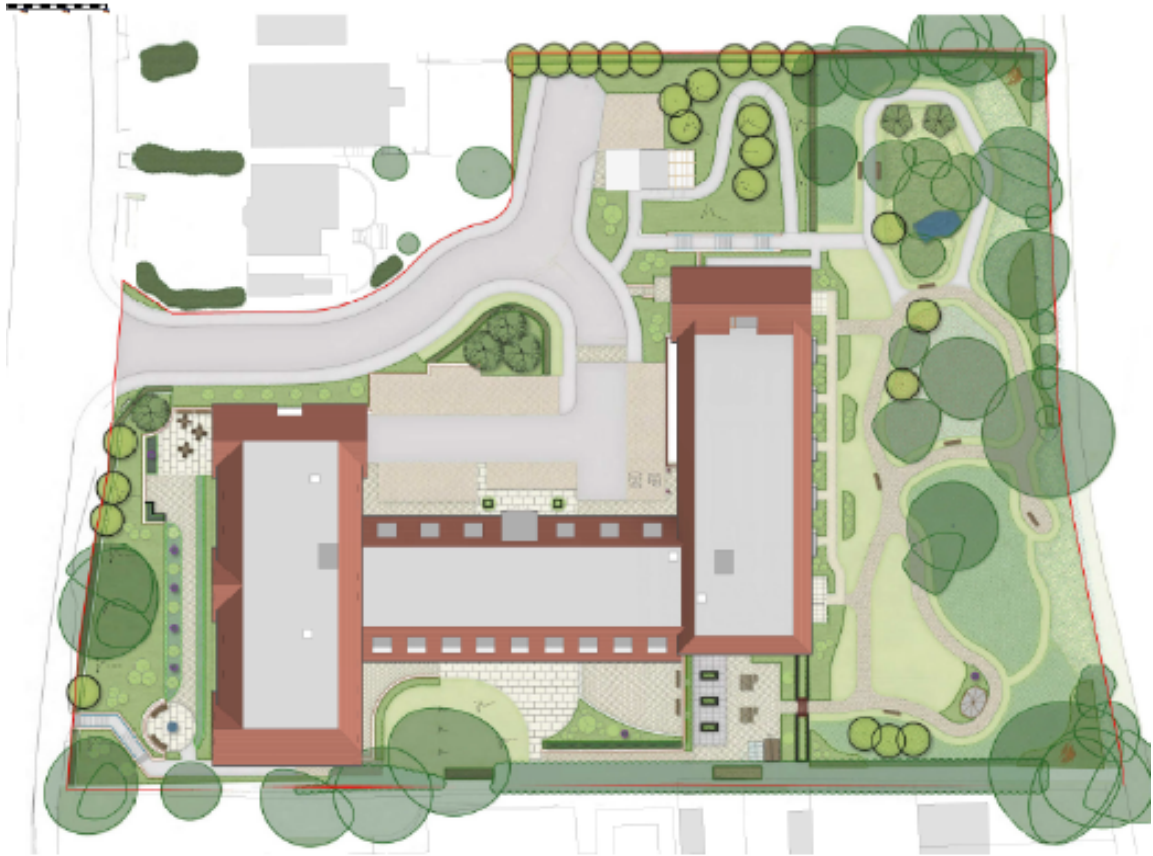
Extract 1 of 2 – Proposed roof level site plan Block A (-1002 Rev P15 received 16/05/23)
